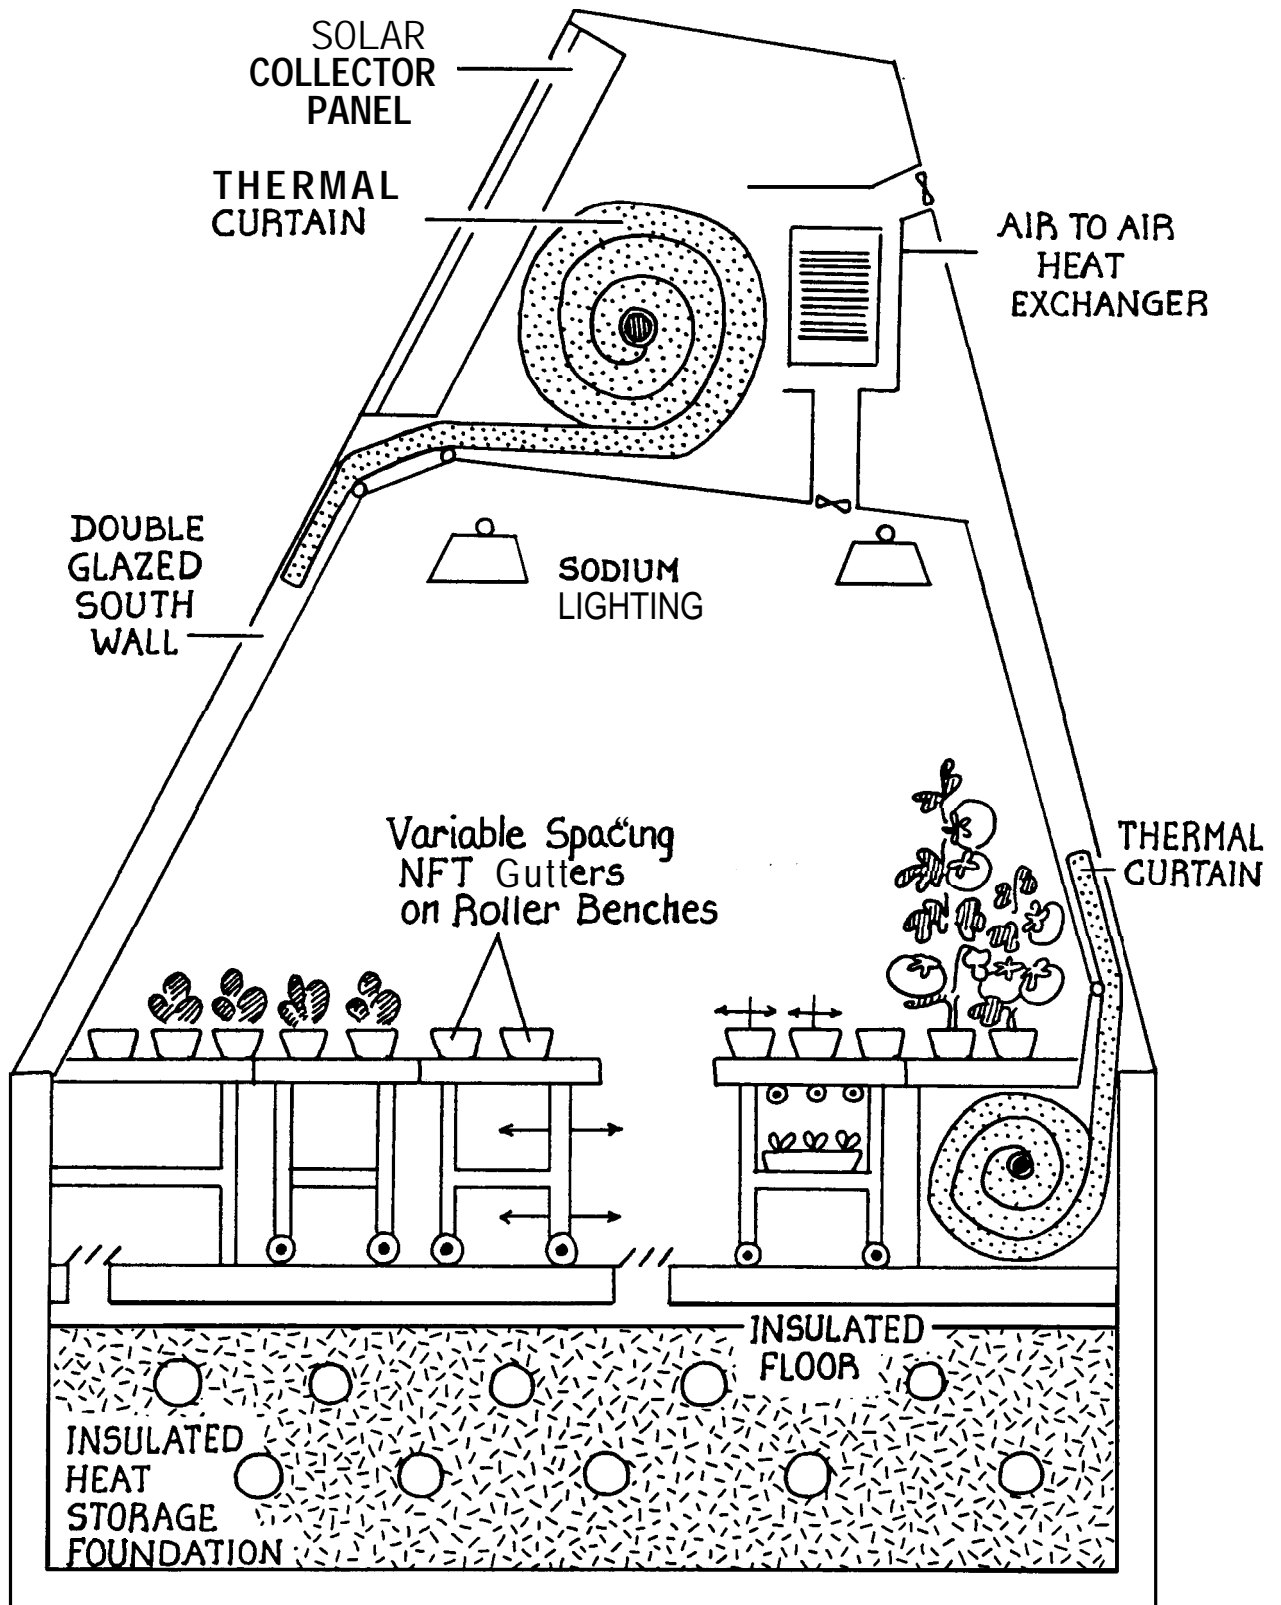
A proposed design for a northern greenhouse based on the Pond Inlet facility.
